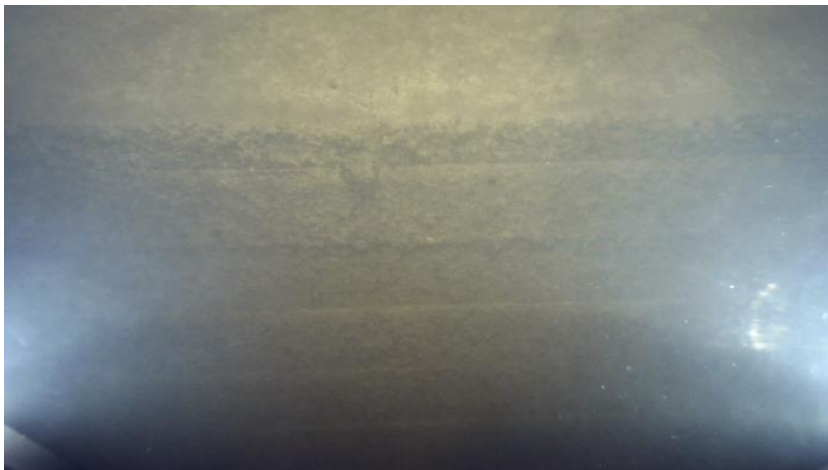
Inspection video of scour outlet valve headstock ([click here](#) or on the figure above to launch).
